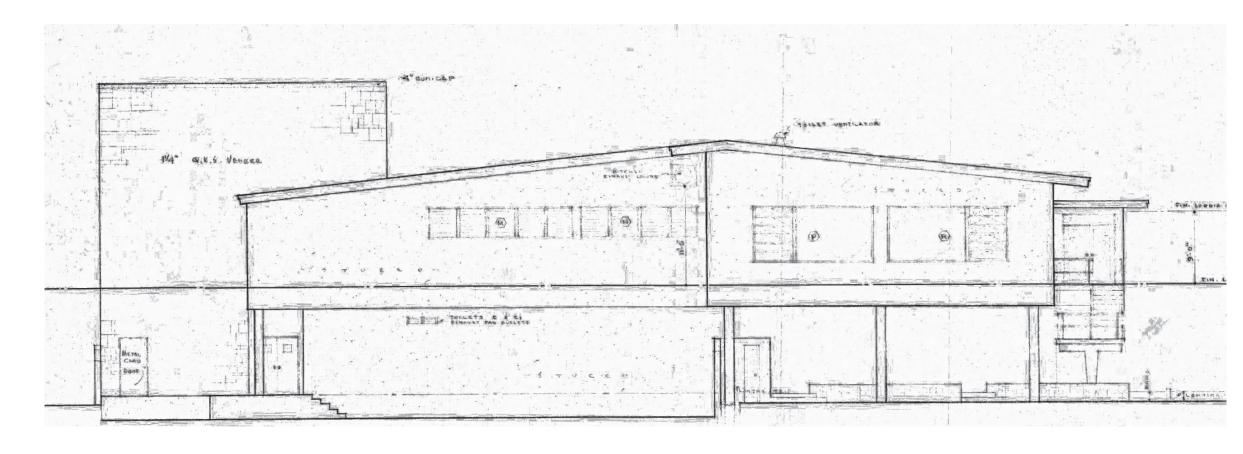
IMAGE S: ORIGINAL BLUEPRINT SOUTH ELEVATION (KECK. JR. ARCHITECT1956)
